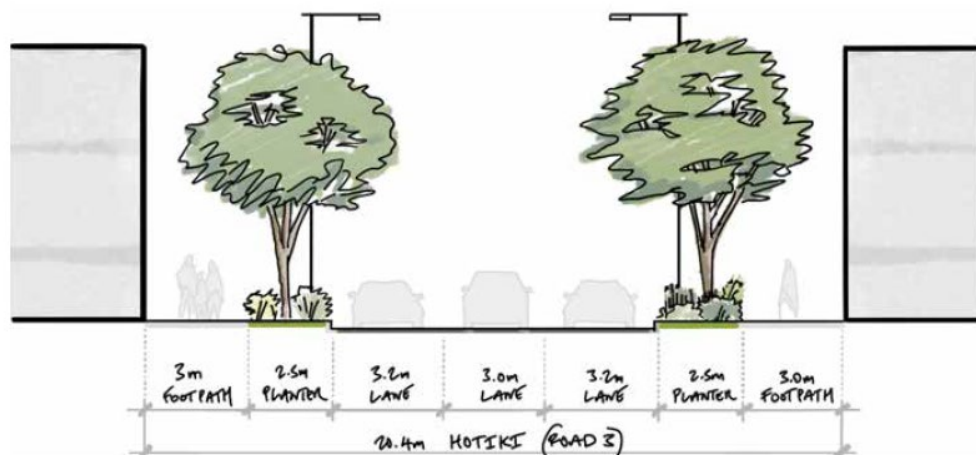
Hotiki Street Typical Cross section (Source: Boffa Miskell)
